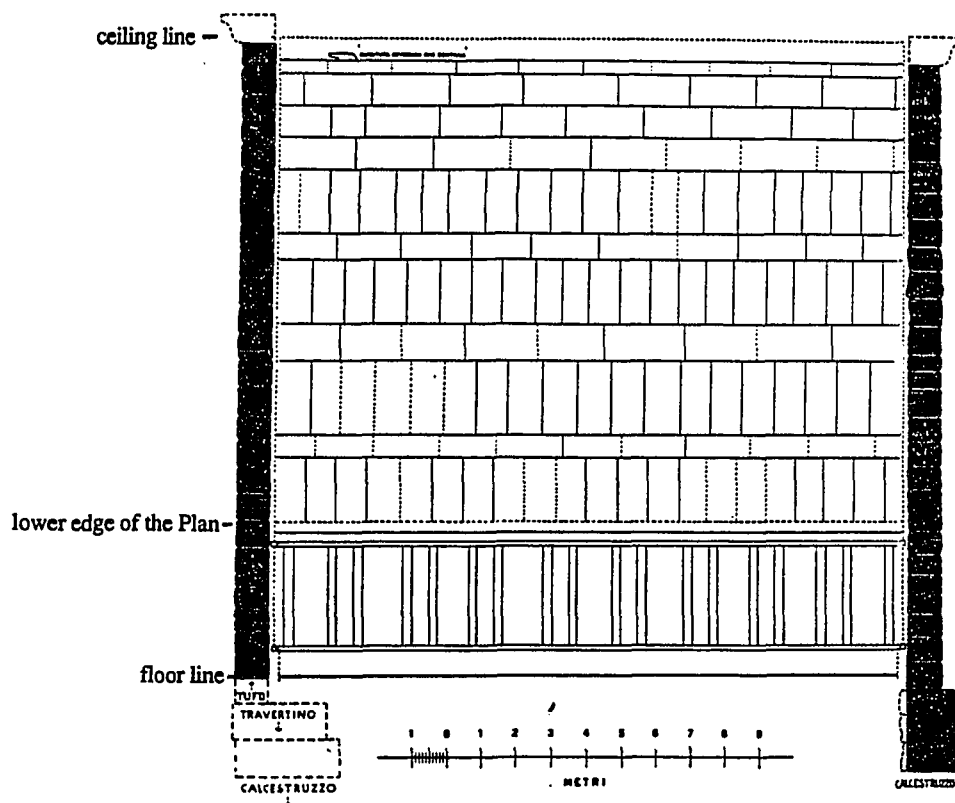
Diagram of the original arrangement of marble slabs that made up the Plan. The lowermost register of large vertical panels was not devoted to the Plan, but instead was wall space elevating the Plan above the point where anyone would come into contact with it. The dashed line running above this register marks the lower edge of the Plan. (*PM*, p. 181)
